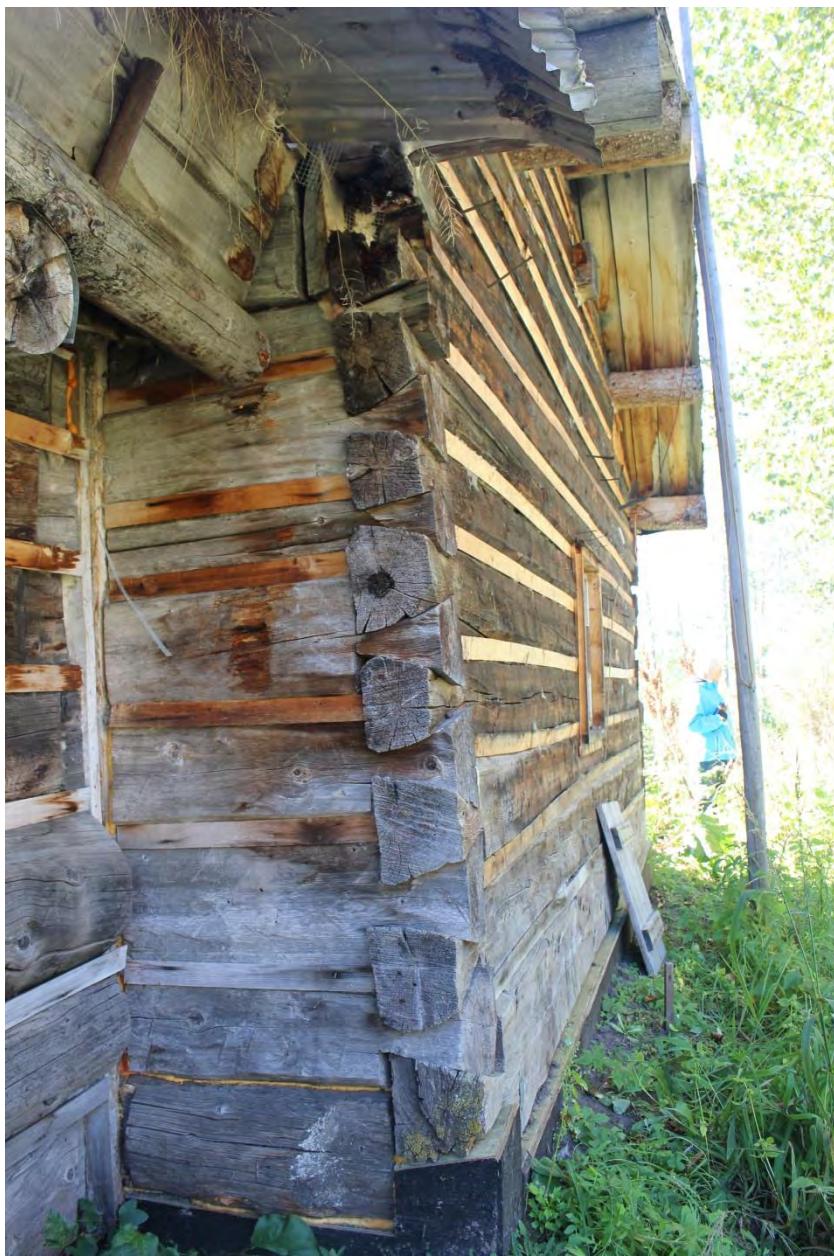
Dovetailed corner, Germaine Cabin, with wood trim covering wall joints.
